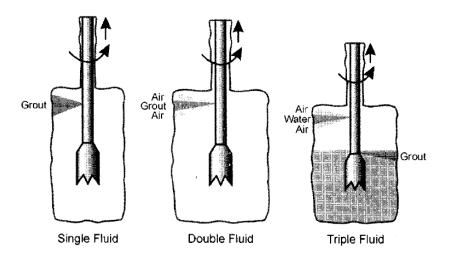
Basic jet grouting systems (Burke et al. 2000)
